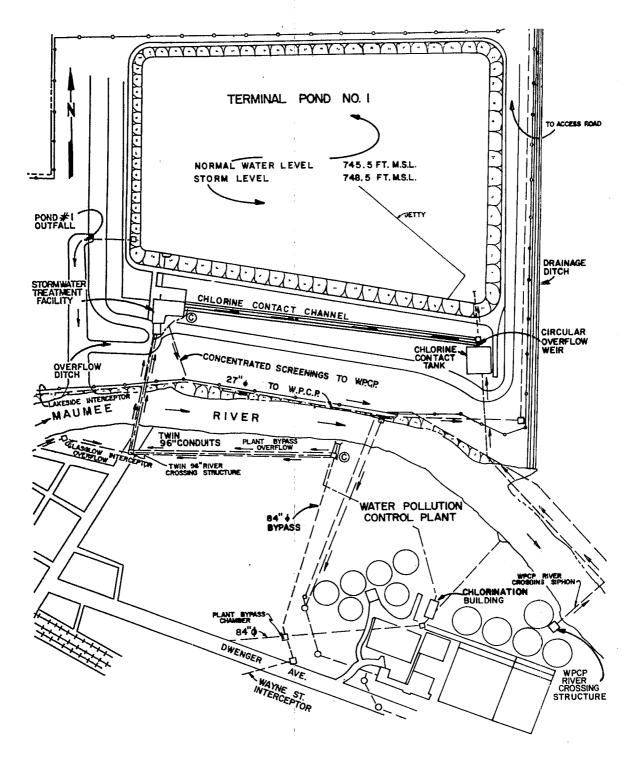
WATER POLLUTION CONTROL PLANT STORMWATER TREATMENT FACILITIES
